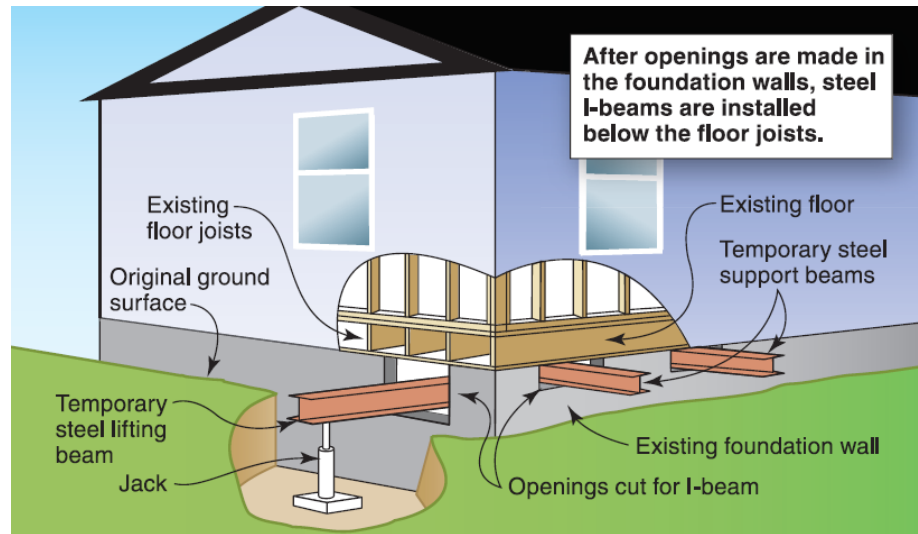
Temporary Jacks installed beneath the home to begin the elevation process (FEMA)
